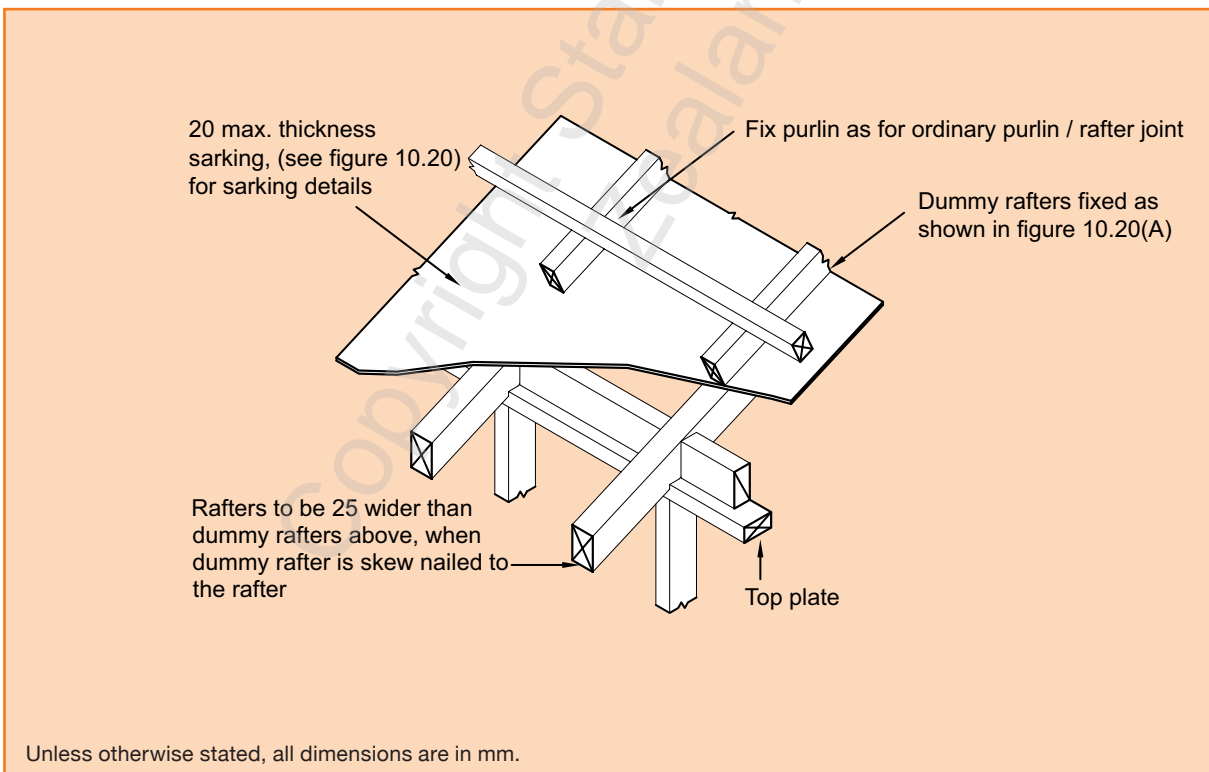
Fixing purlins and dummy rafters to skillion roofs (see 10.2.1.16.2 and 10.2.1.17.2)
